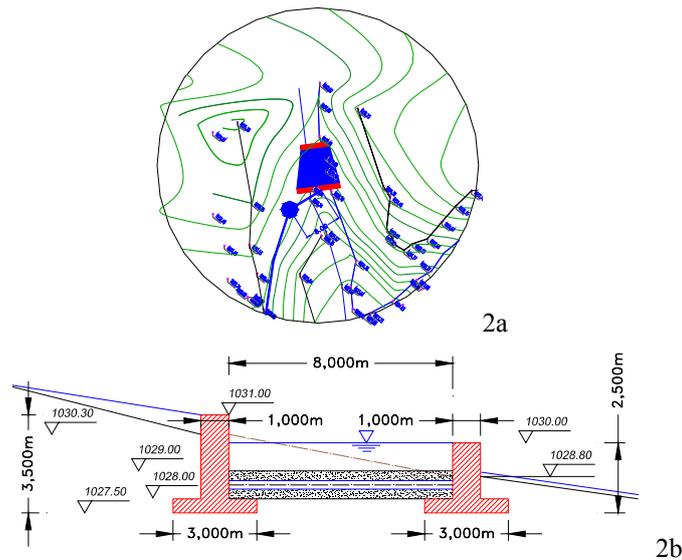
Capture water from the stream a) plan view b) longitudinal section
